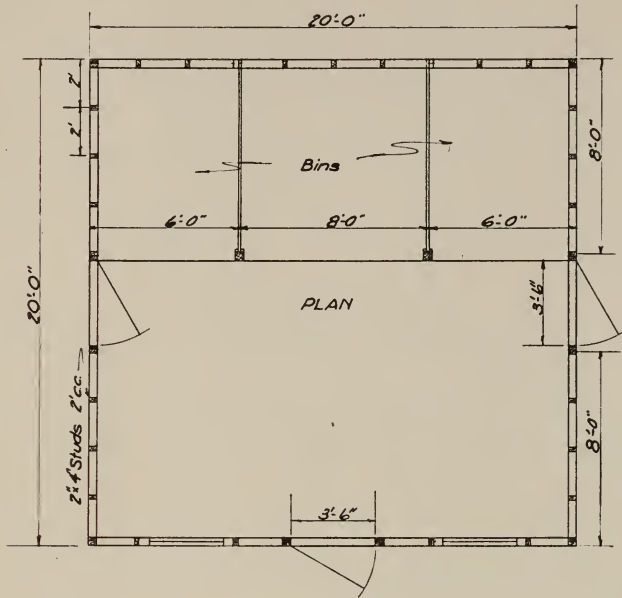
Floor plan of one-story, feed storage and egg room.
